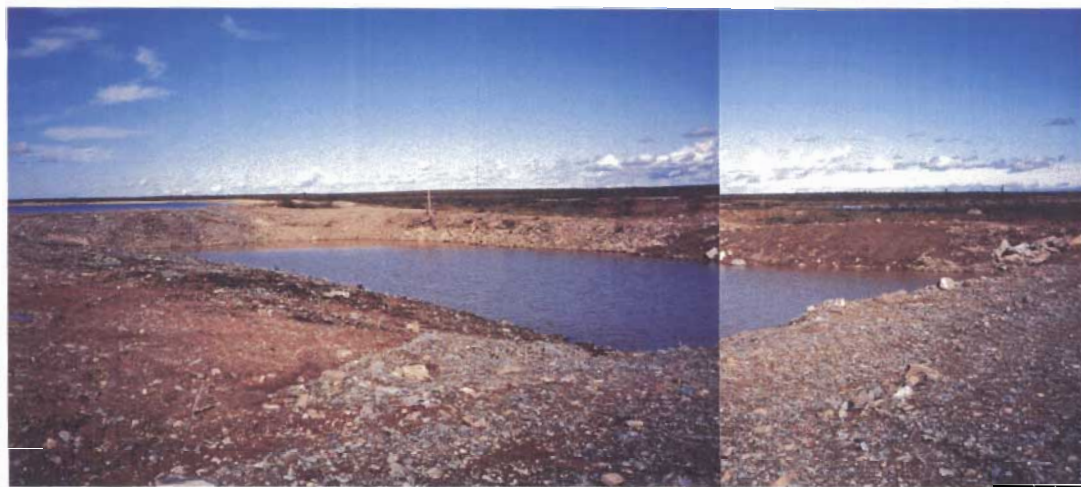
A close up view of the Quarry Pit pond. Notice the work to tidy up the side slopes of the pond. Photo is looking north/northeast. Tailings Ponds No. 1 and No. 2 are on the horizon (Pond No. 1 - left, Pond No. 2 - right)
